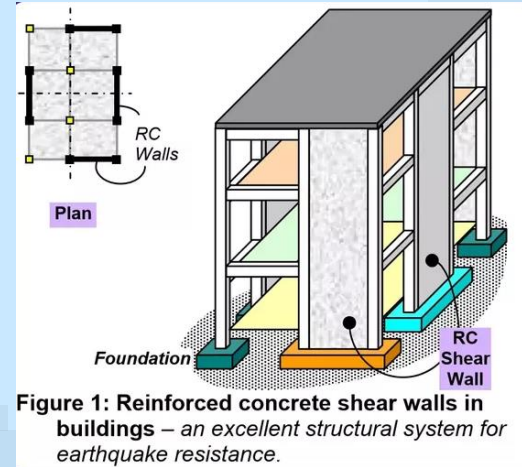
Reinforced concrete shear walls in buildings – an excellent structural system for earthquake resistance.
